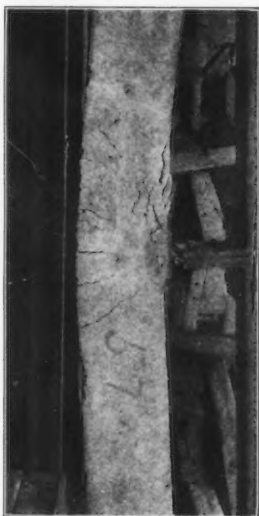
BEAM TESTED FOR BOSTON TUNNEL, WITH STIRRUPS AND BOTTOM RODS, SHOWING TYPE OF FAILURE.
